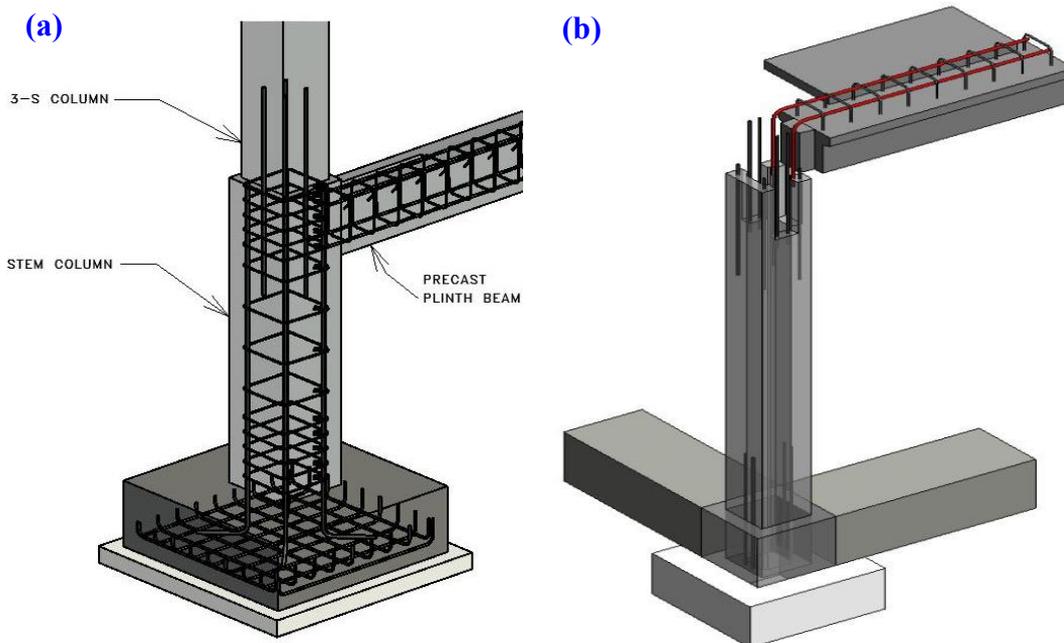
Connections details of (a) sub-structure to super-structure and (b) precast moment resisting frame column beam assembly
